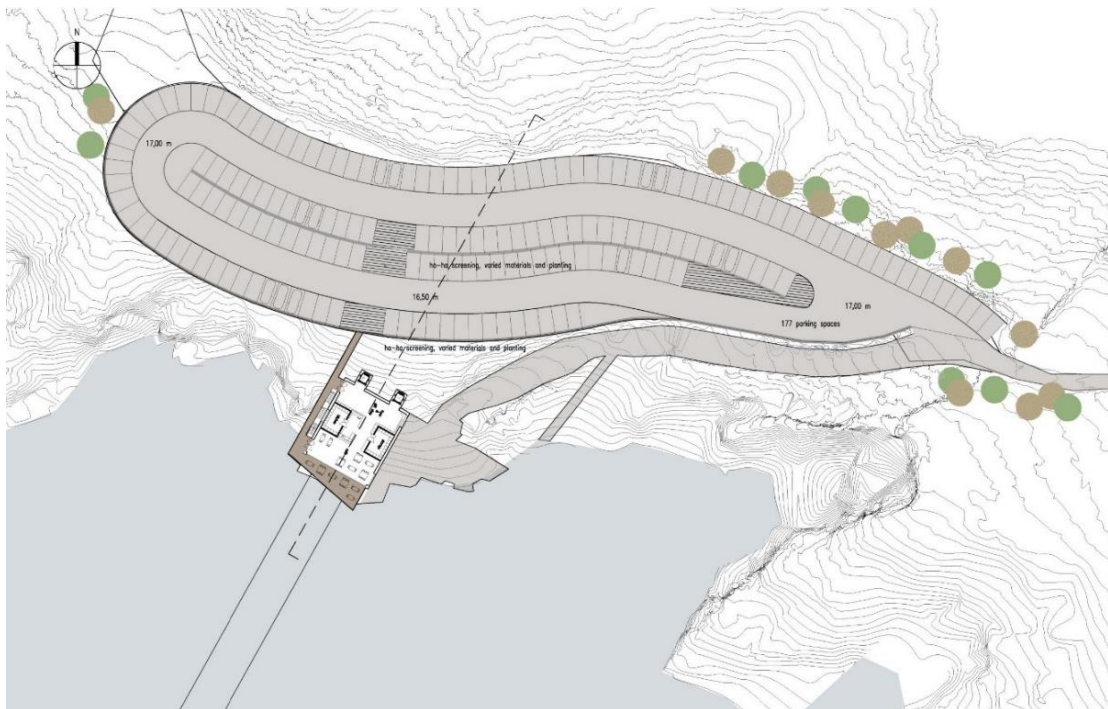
Option 2 architectural site plan, showing the tower location between the car park and the slipway
